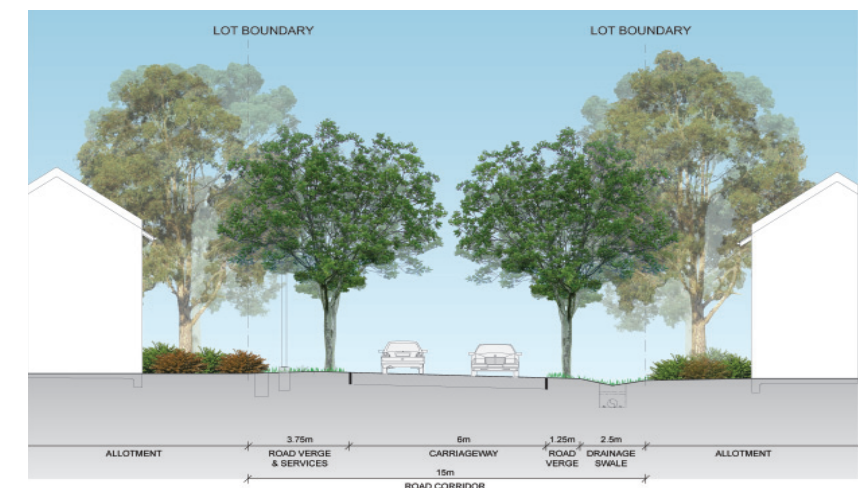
Section D-D through 15 metre Wide Local Road - No Parking.
